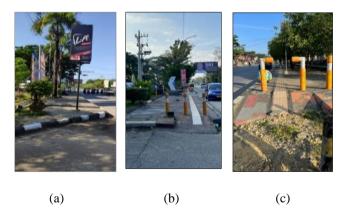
Pedestrian pathway access in Abunawas Street (a), Abdul Silondae Street (b) and Tebaununggu Street (c)
